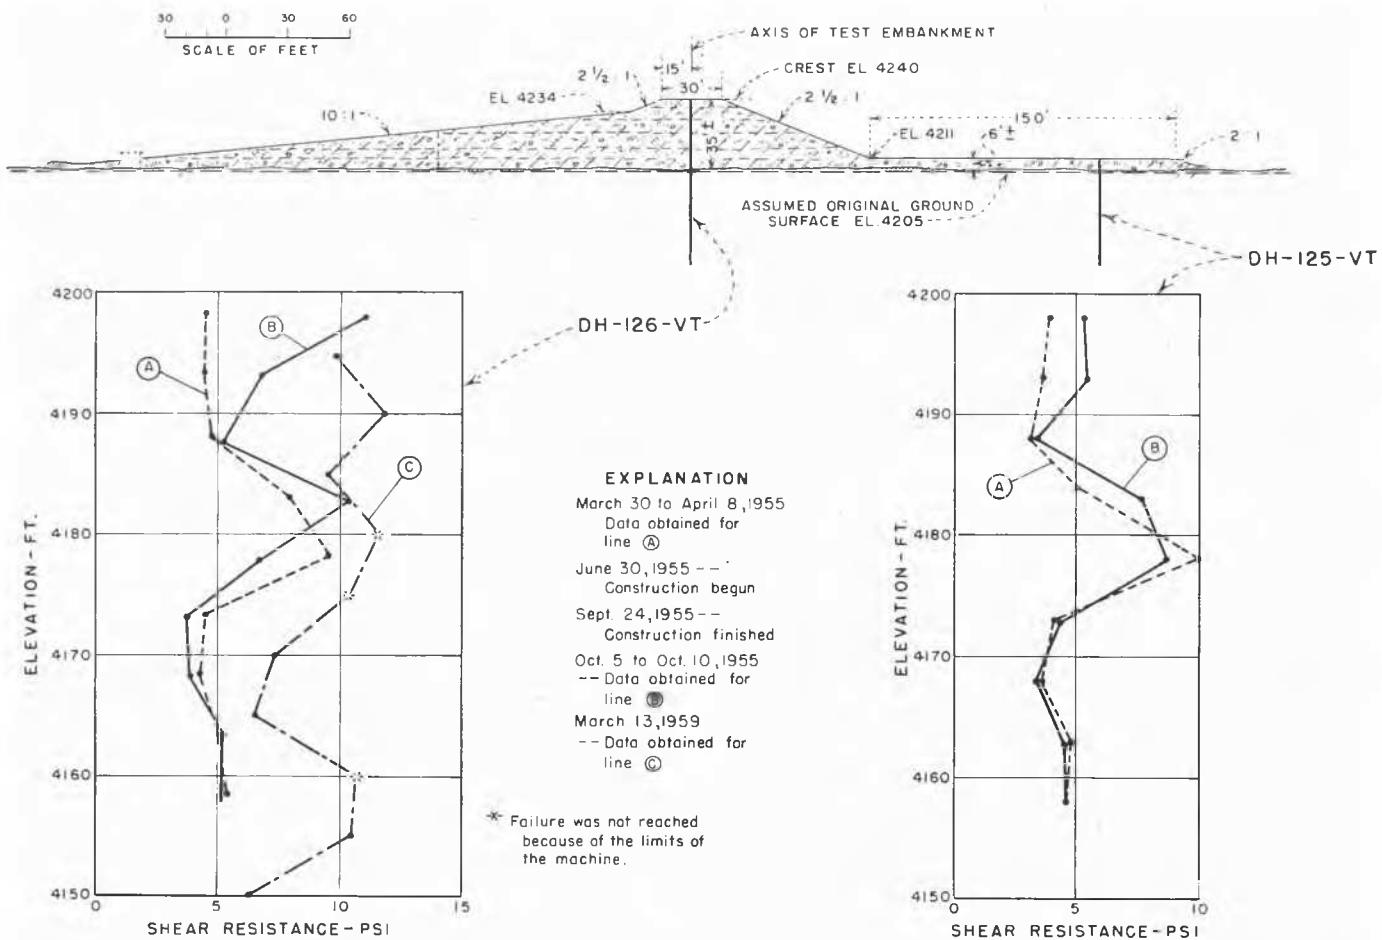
Vane test studies in the foundation of a test embankment at Willard Dam.
